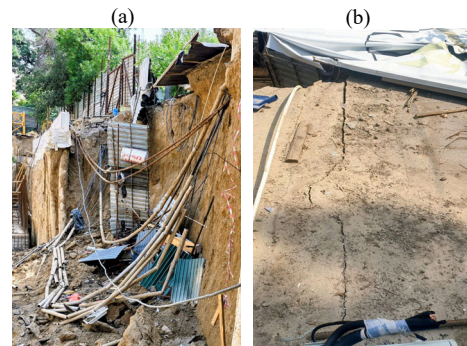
Fragment of the 11 m high retaining wall collapse and the formation of favorable deformations behind the preserved part of the wall (a). Areas of stretching and resulting formation of horizontal cracks (b).
